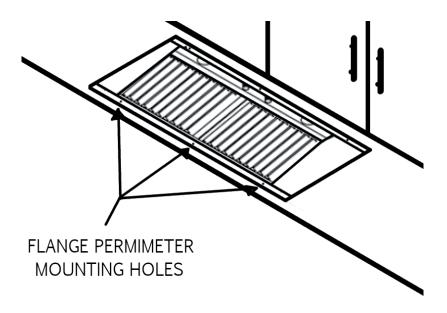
SECURE FLANGE TO MOUNTING LOCATION
